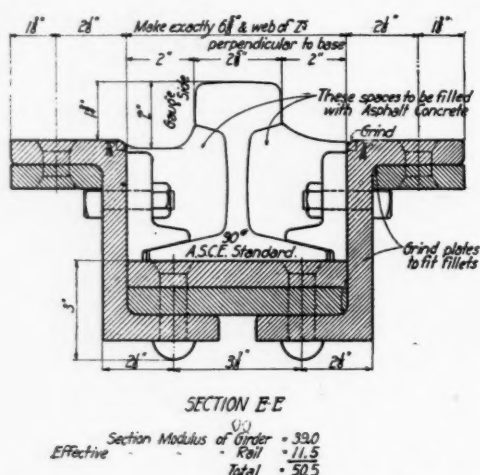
Details of Rail Girder for Shallow Bridge Floors.
